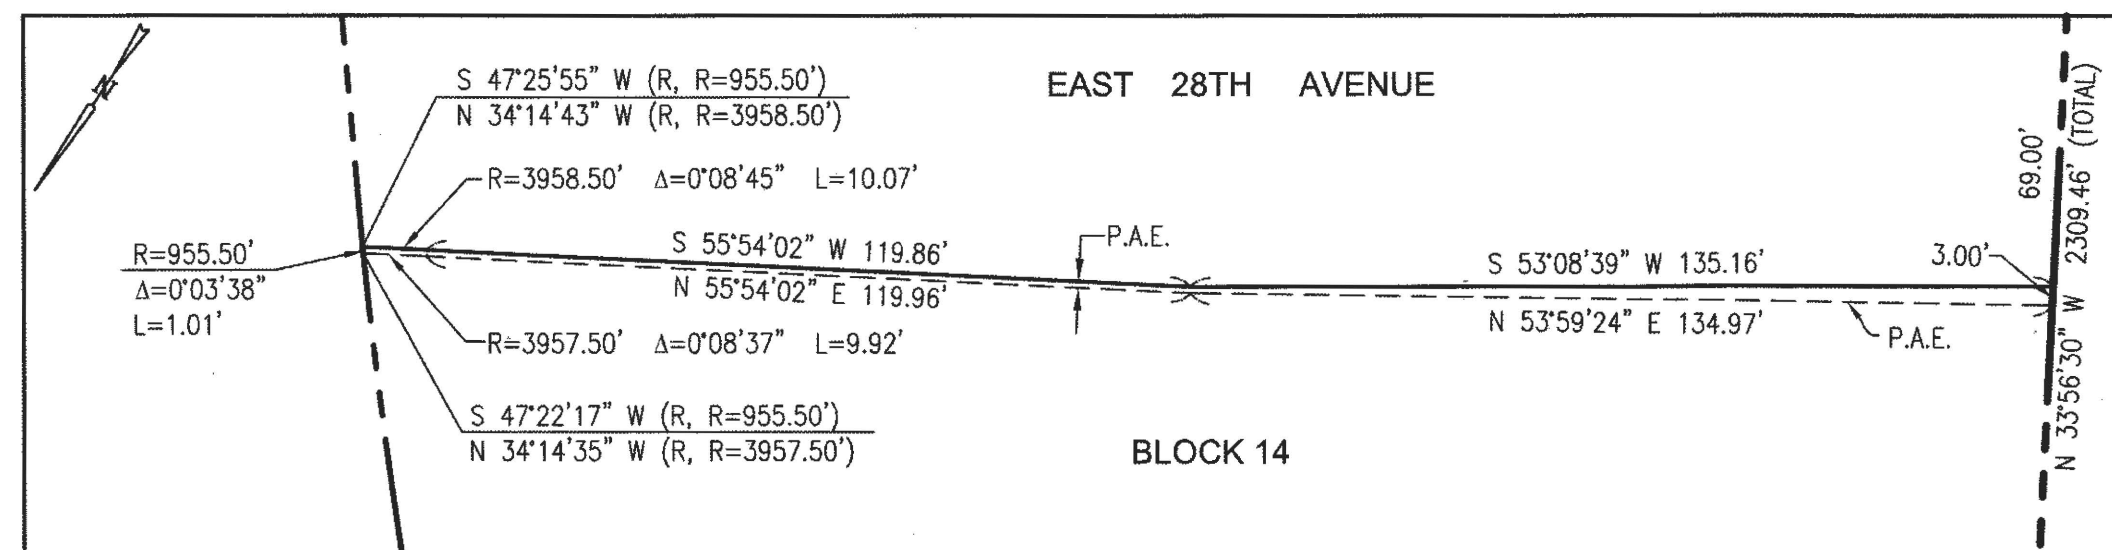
DETAIL 'C' - SIDEWALK EASEMENT (S.W.E.)
